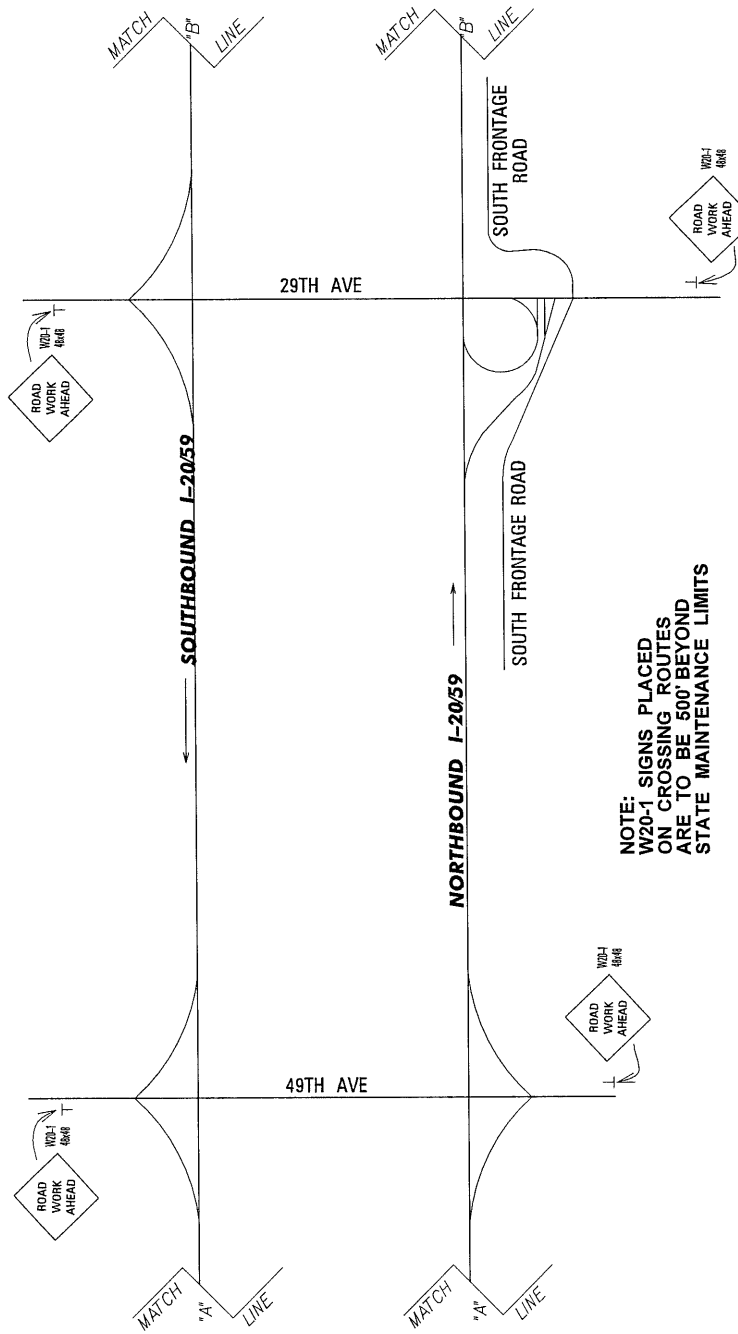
DETAIL OF CONSTRUCTION SIGNING NORTH & SOUTH BOUND
